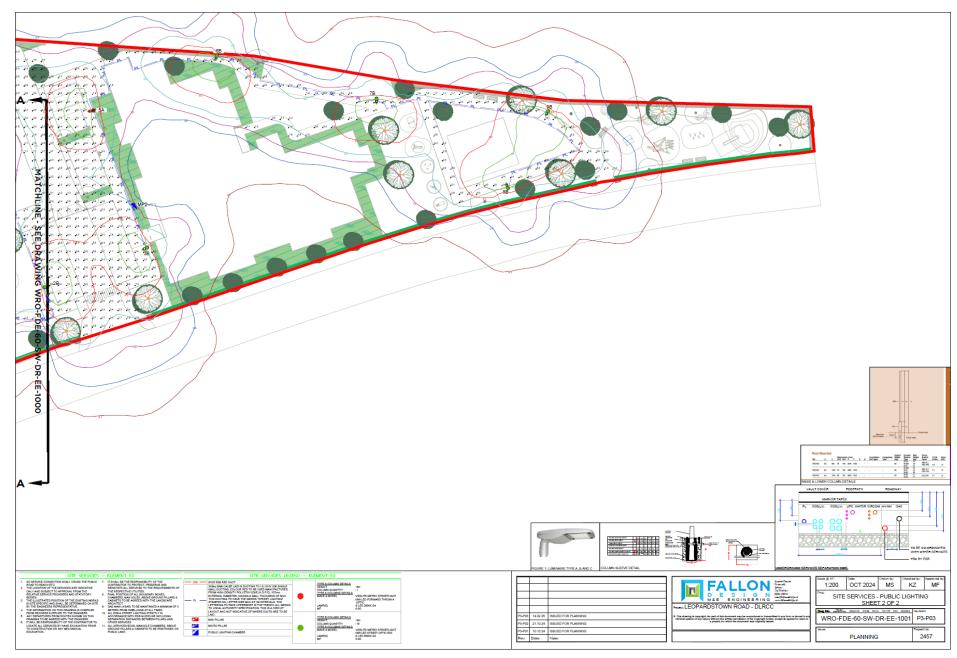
Site services – public lighting layout (Sheet 2 of 2)
